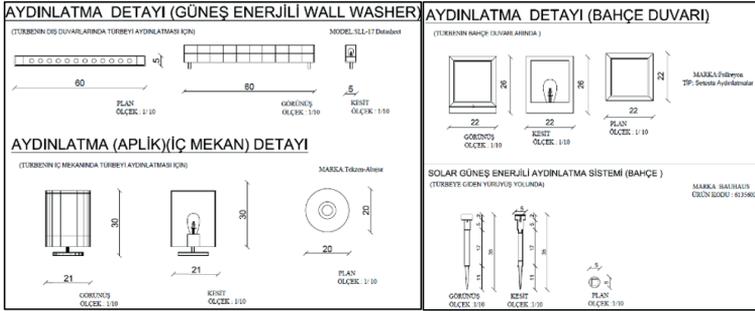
Ismail Dede Tomb restoration project site plan lighting elements
